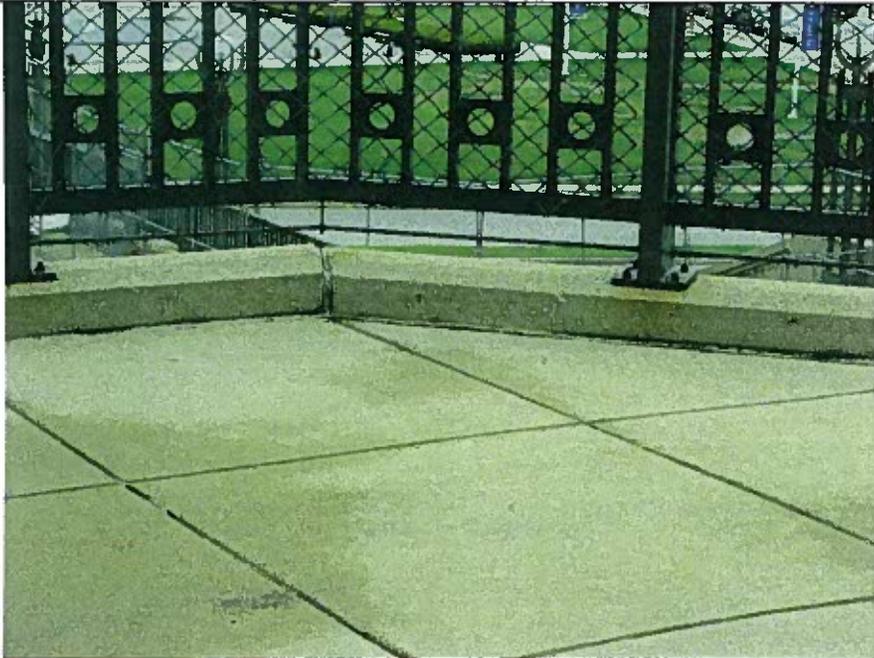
Cracks in concrete wall between restaurant and plaza
